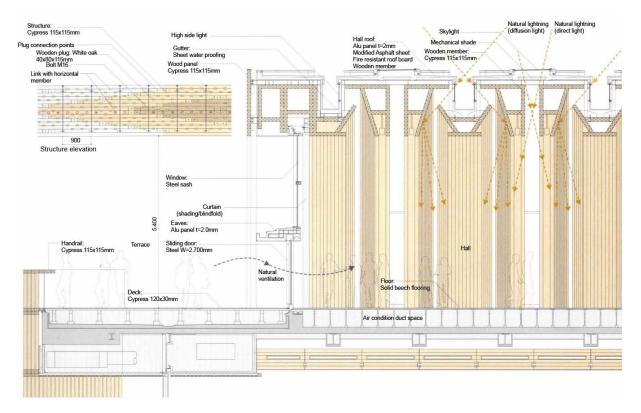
f - Detail of the hall and terrace; Dimensions in [mm]
